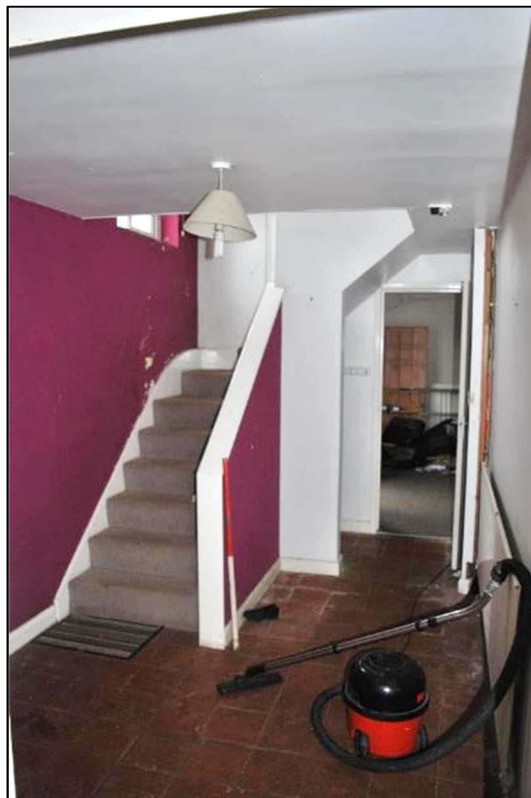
(Shot 73): Northeast elevation, looking west-southwest (1m scale)
